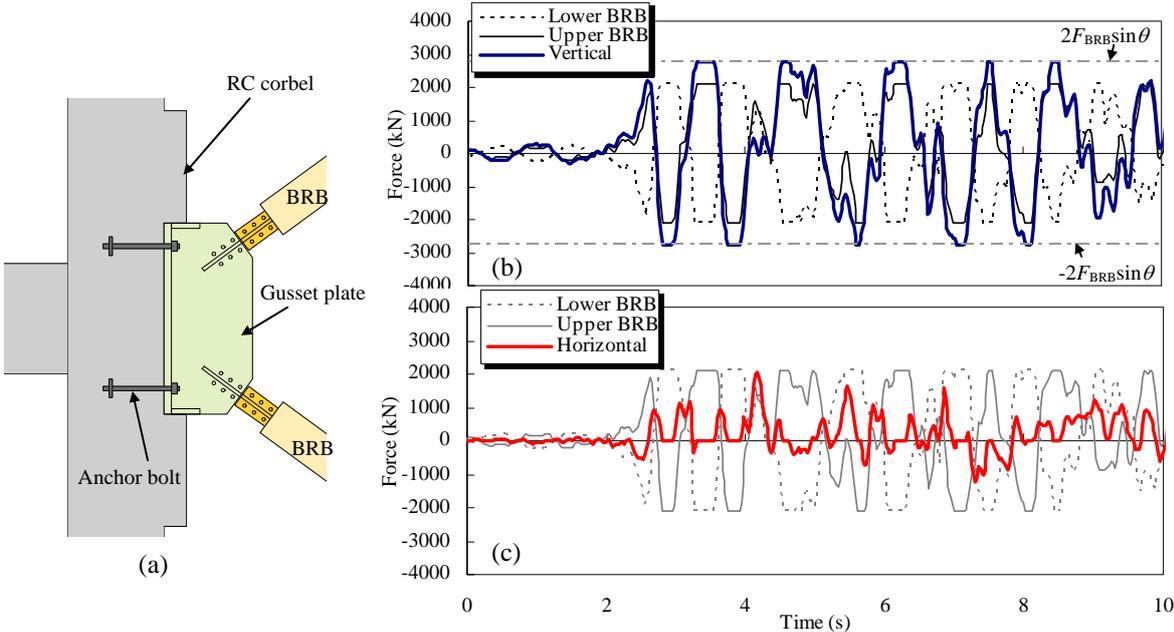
Force in the BRB connection at 6th floor under JMA Kobe-NS: (a) connection detail, (b) vertical component and (c) horizontal component.
